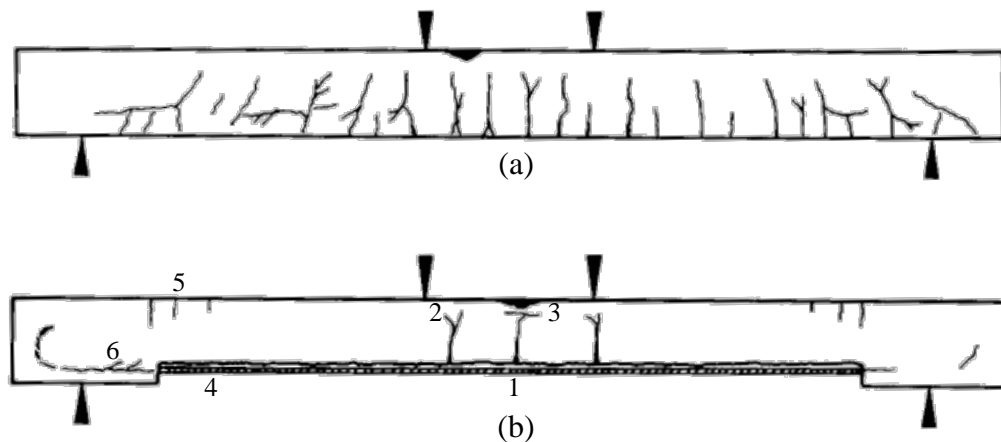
Contrast in Crack Patterns between: (a) Control Specimen and (b) Specimen with Exposed Flexural Reinforcement (Cairns and Zhao 1993).
